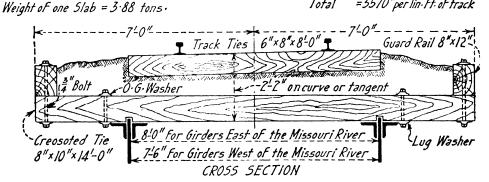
Standard Ballasted Floors. Chicago, Milwaukee & St. Paul Ry.
